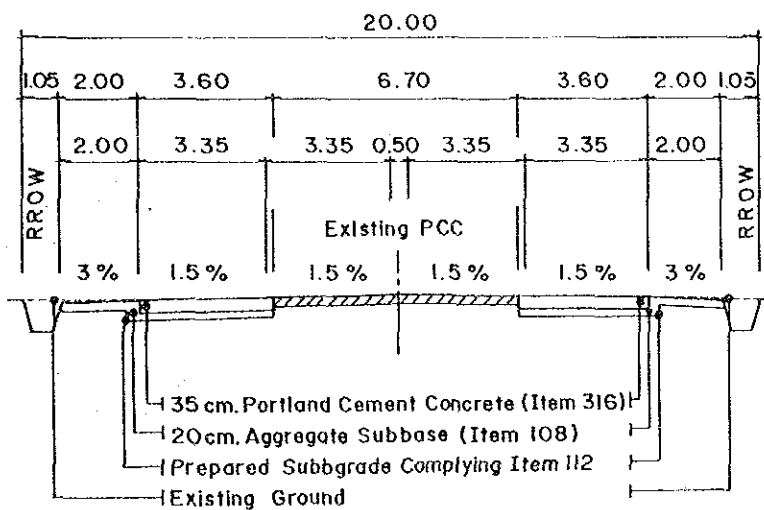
PROPOSED WIDENING TO FOUR LANES
